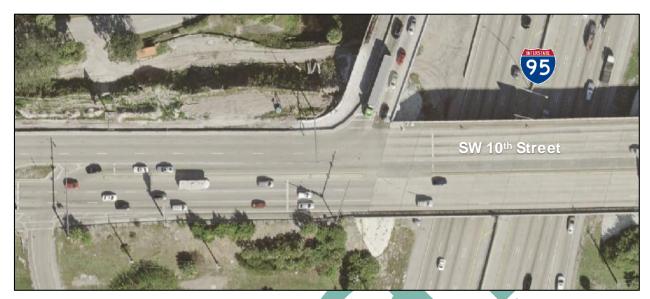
4: Existing Roadway Segment - SW 10th Street
